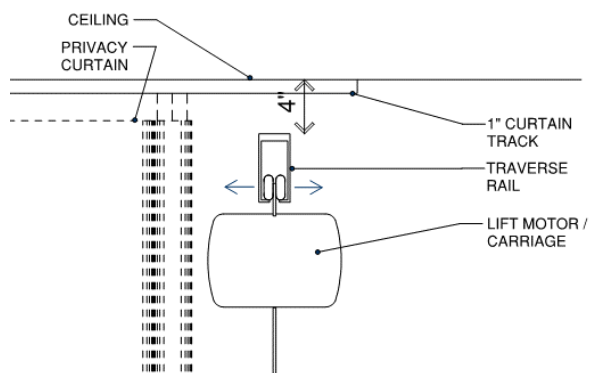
Additionally, a recessed lift system or other configuration that minimizes the space between the ceiling plane and top of traverse rail will require curtain track coordination.
